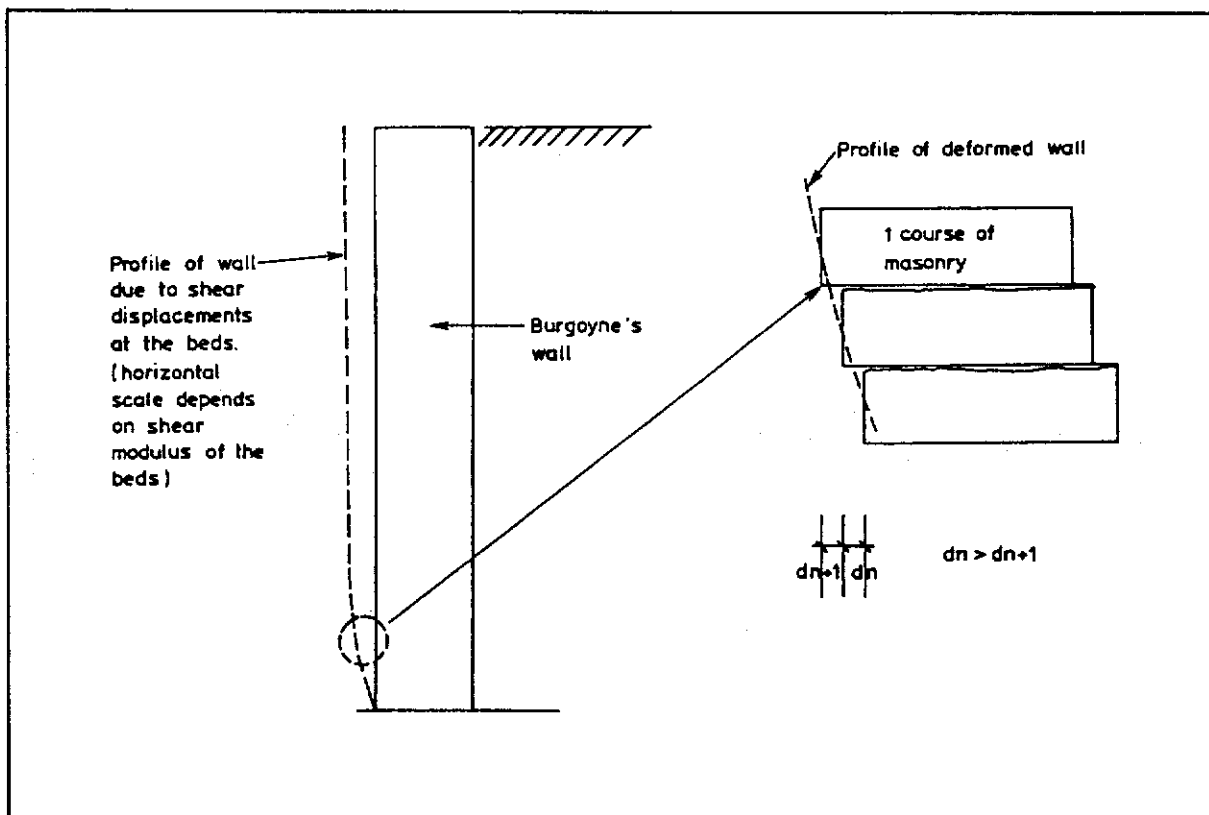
Deformation of Masonry Retaining Wall due to Shear Displacement at the Beds
